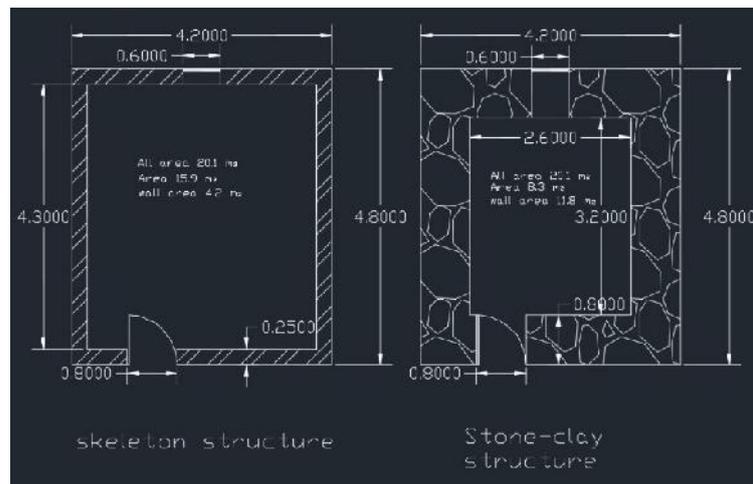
Space with a Clay or Stone Wall and Structural Brick.
